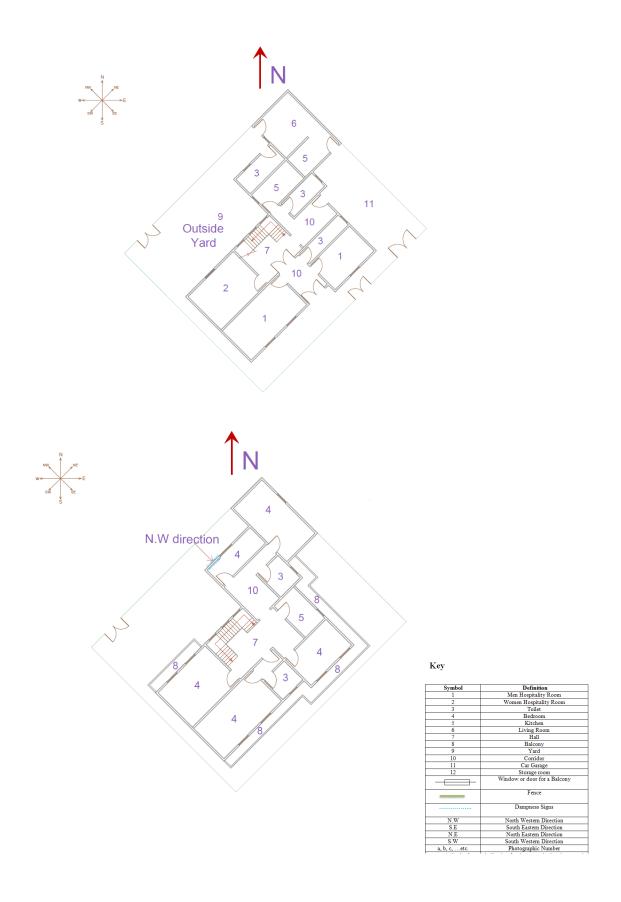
Ground floor and first floor plan of house 7, West Albeida quarter, Albeida, Green Mountain, Libya
